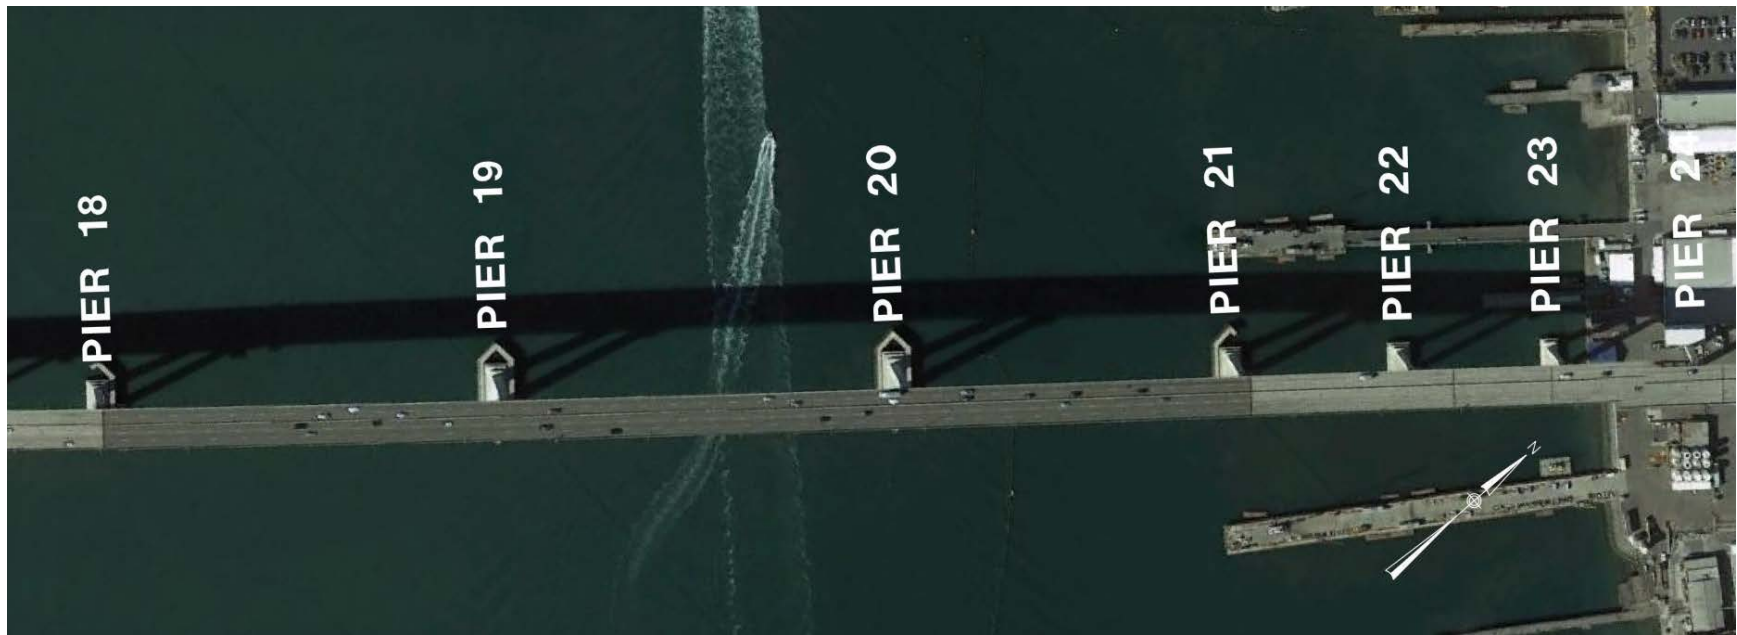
Coronado Bridge Aerial and Elevation (Pier 18 through Pier 24) – Mid-Span to Eastern Extent
